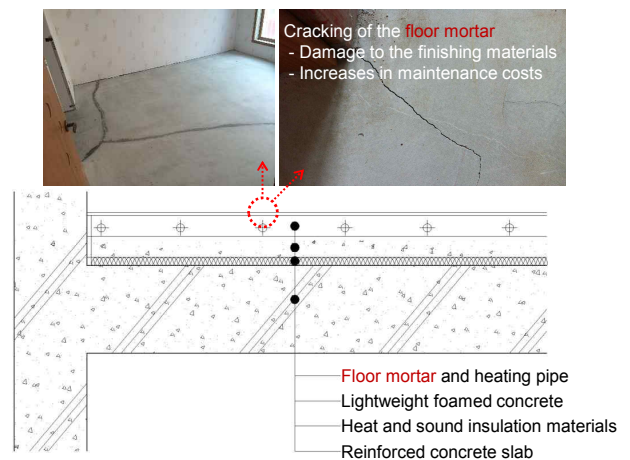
Floor structure of apartment building and cracking of the floor mortar
